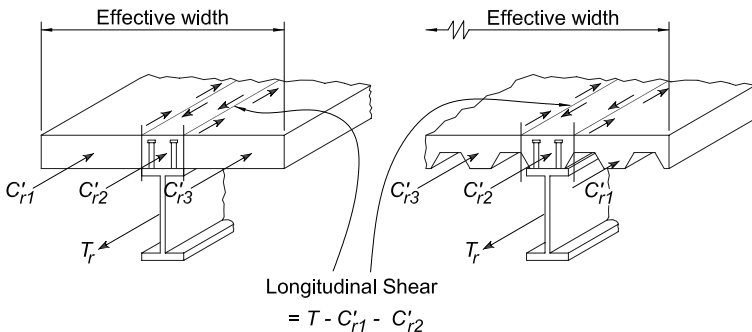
Longitudinal shear in the slab [after Chien and Ritchie (1984)].
